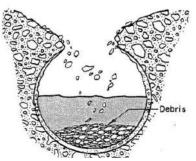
Backfill continues to wash into Sewer Blockage and/or Street collapse
